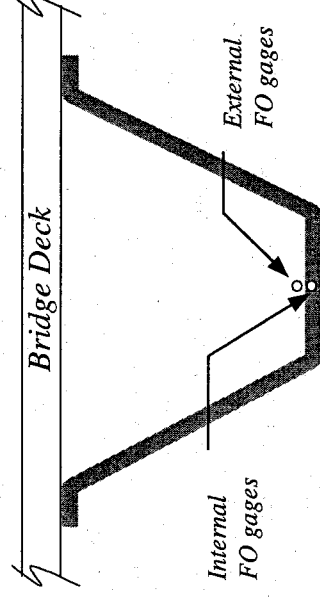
Sensor locations within the cross section of the box girder of the MMM Tech 21 bridge
